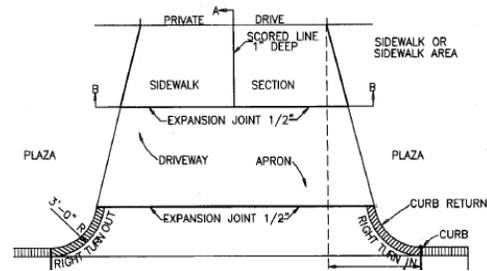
Wilmington Standard Driveway Detail (SD 8-02)
